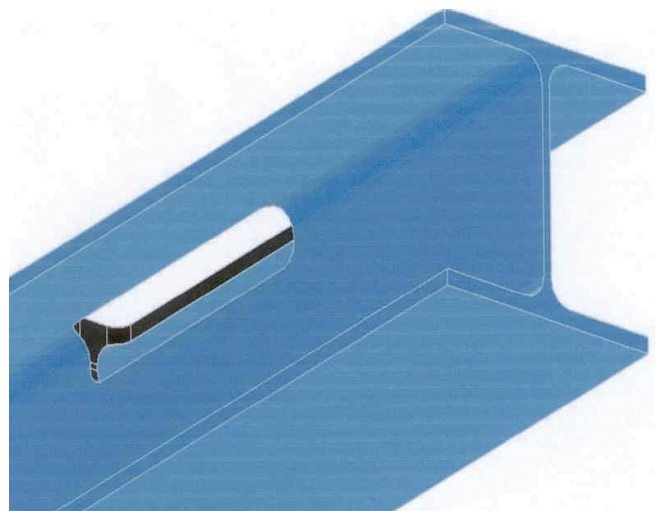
Wide-flange bracing member with material removed to create structural fuse (courtesy of Richard Vincent).
